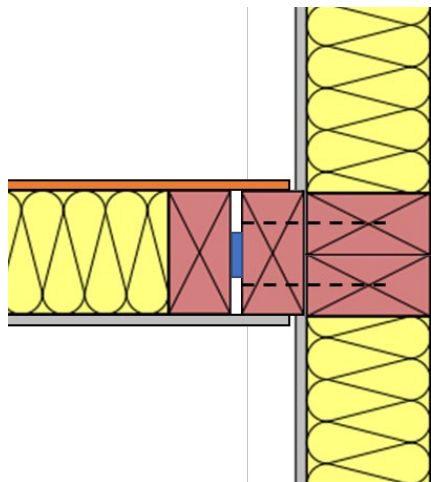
Cross section of the investigated T-joint of timber a frame wall and a timber frame ceiling component
